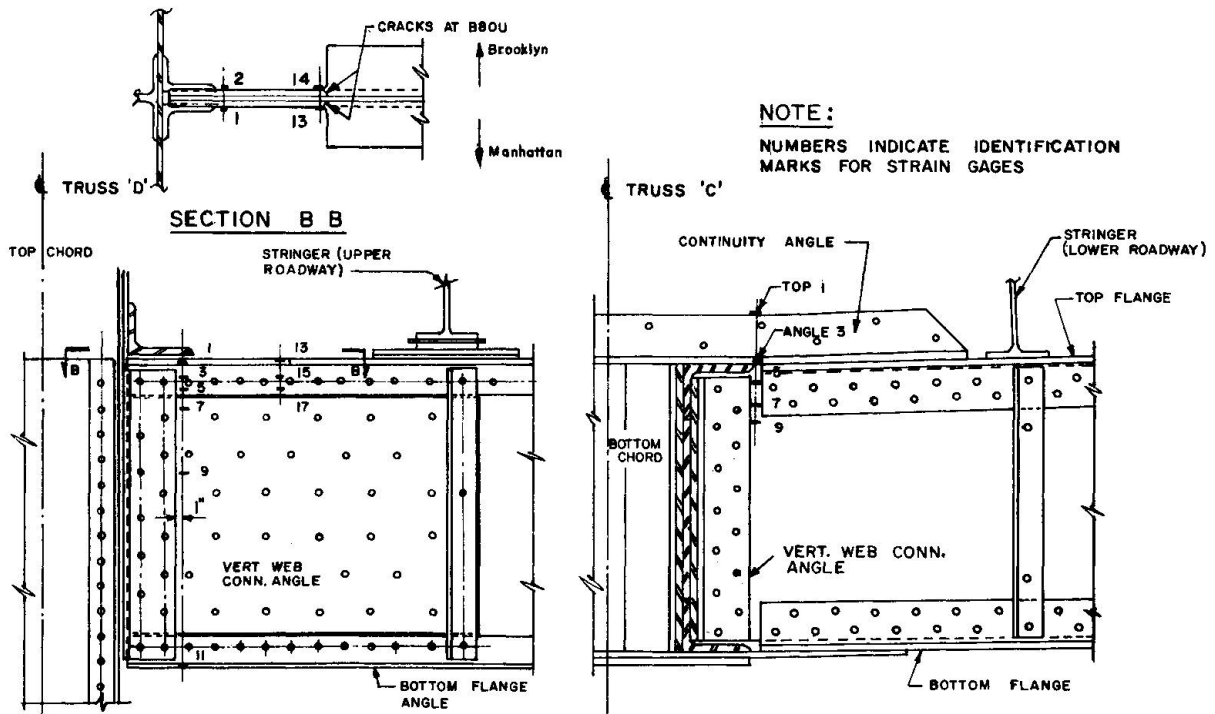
Strain Gages on Upper (Left) and Lower (Right) Floor Beams
